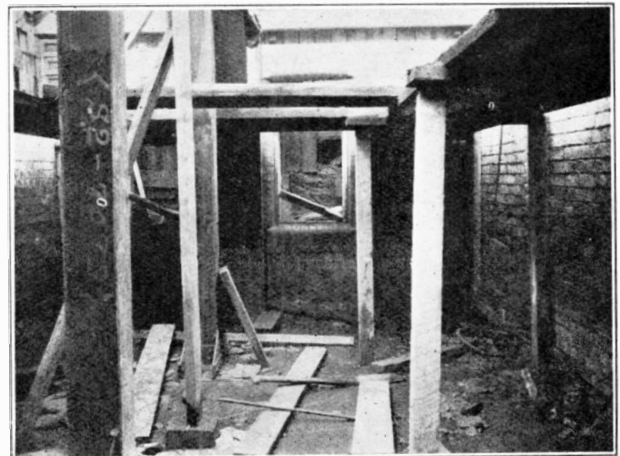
CONSTRUCTION OF EXCHANGE MANHOLE.
